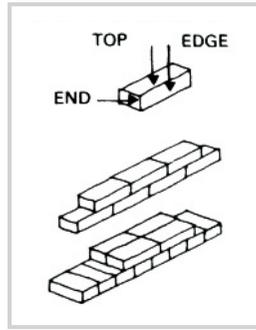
Surfaces of a brick, wall made of stretchers and wall made of headers and stretchers
